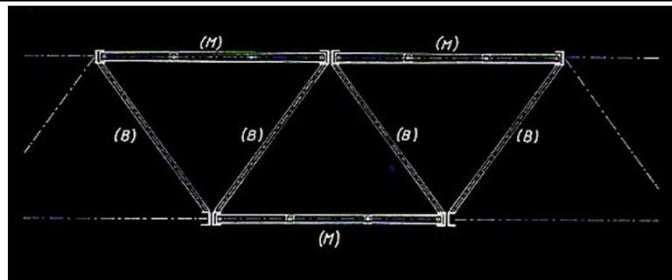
Assembling systems based on planar truss to single struts connection [3]
